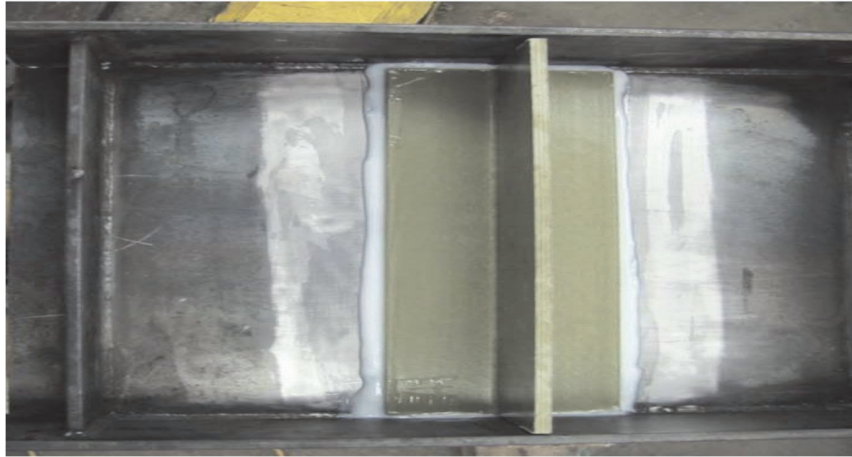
Glass FRP T section stiffening used by Okeil et al. [18].
